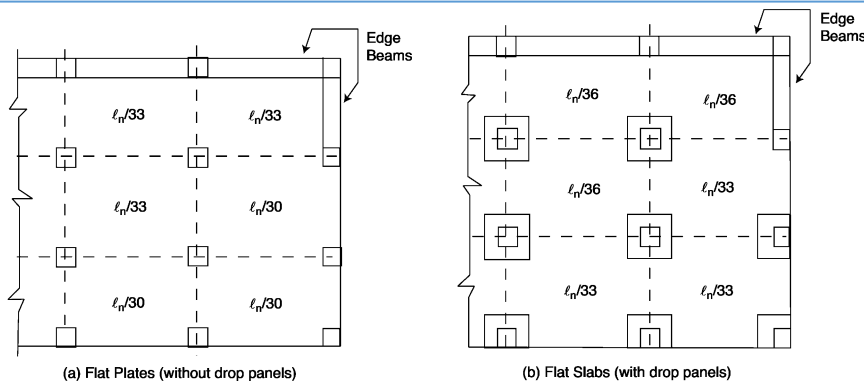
Minimum Thickness of Slabs without Interior Beams (Grade 60 Reinforcement)
